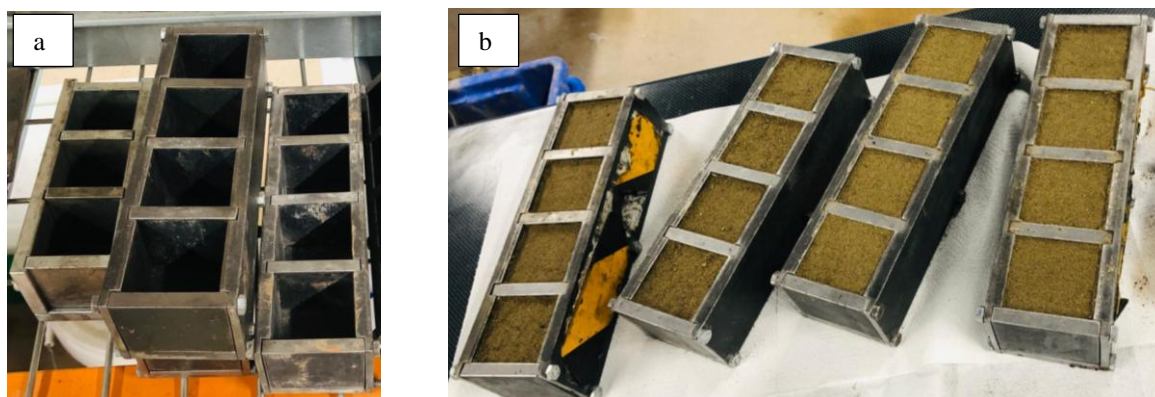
(a) Moulds used for casting (b) Moulds filled with the VA-hybrid
